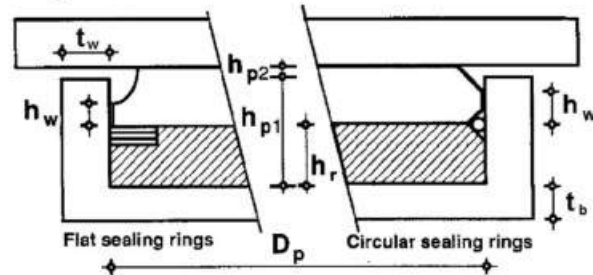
Pot Bearing—Critical Dimensions for Clearances
